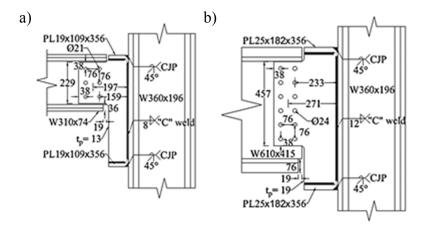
Details of test specimens: (a) BG3-2-13-F-200C, (b) BG6-2-19-F-500C
